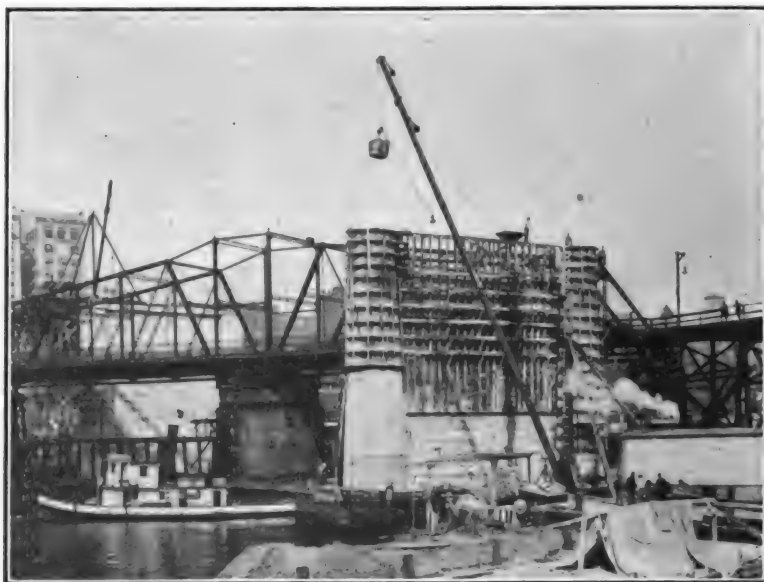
OLD PIVOT PIER, TACOMA, WN.
